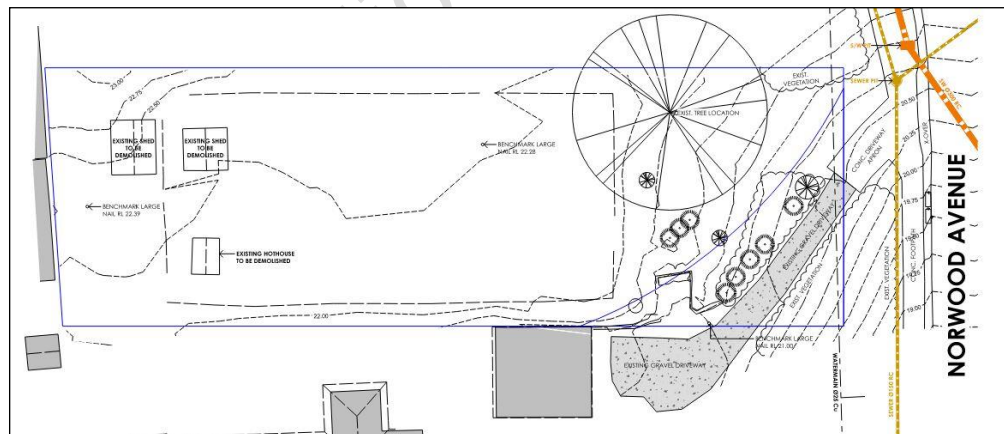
Existing site plan indicating outbuildings proposed for demolition.
